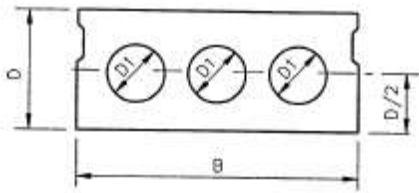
PRECAST PRE STRESSED VOIDED SLAB SECTION
